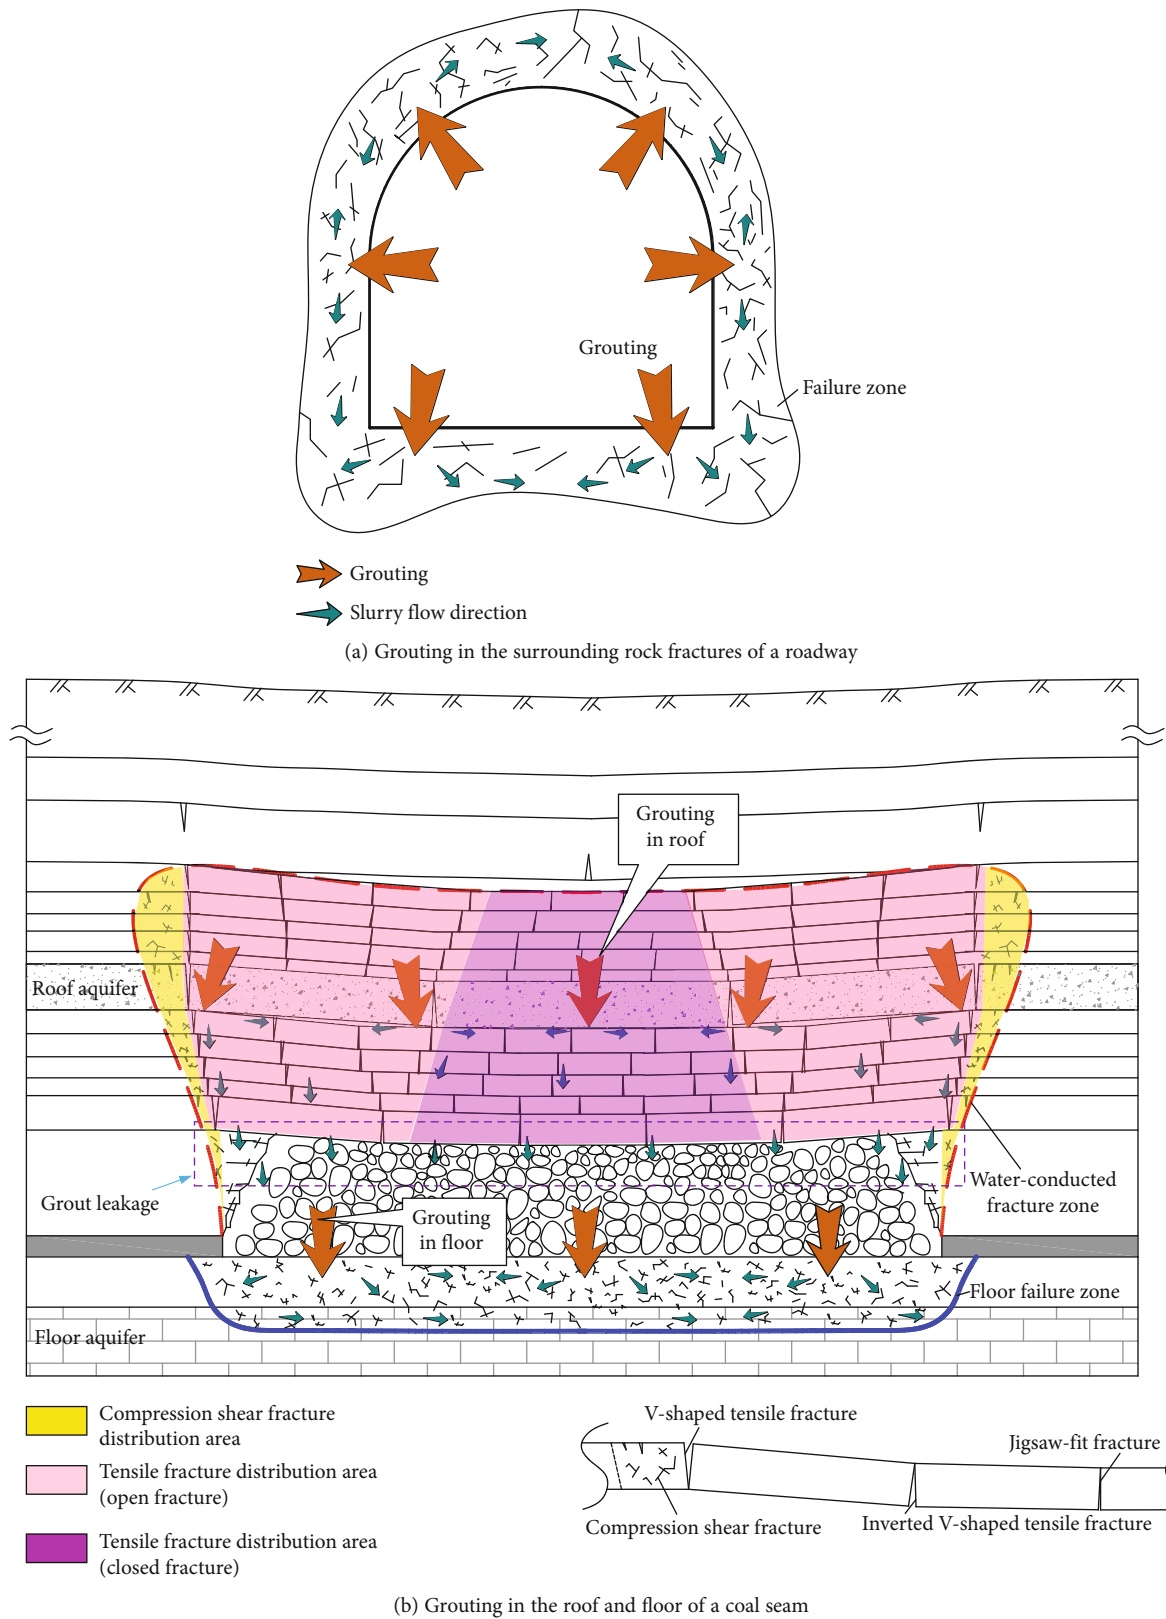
Schematic diagram of grouting in the surrounding rock fractures of a roadway and the mining-induced roof and floor fractures of a coal seam.
